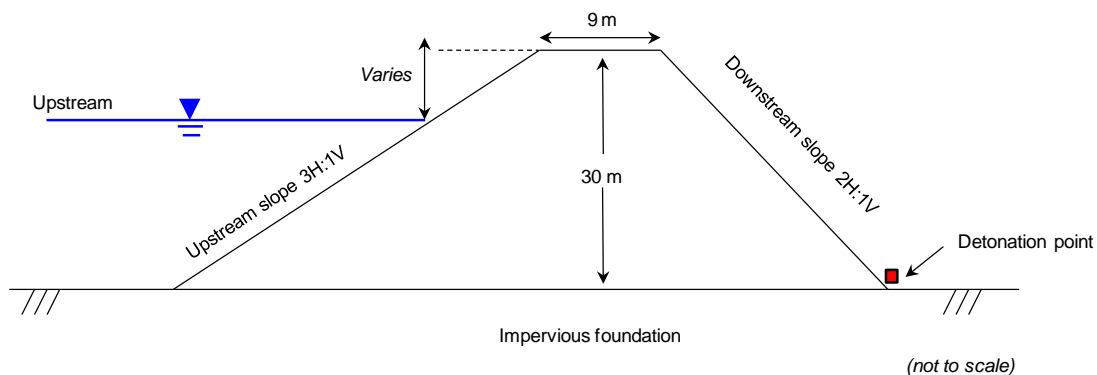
Geometry of earthen embankment dam (not to scale)
